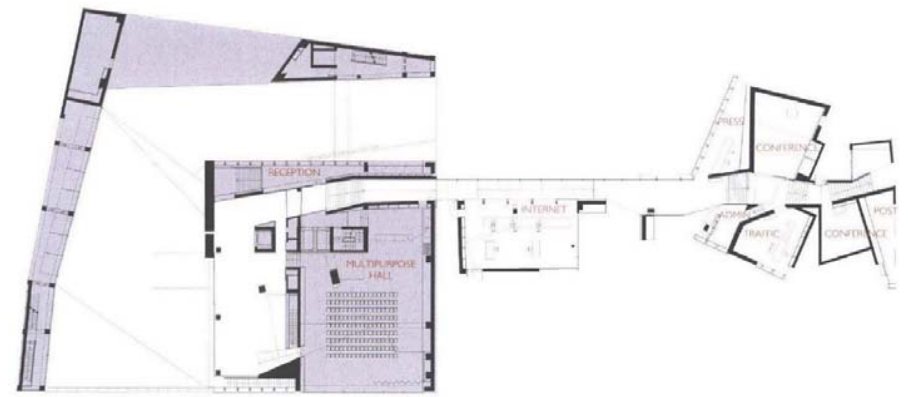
Plan of 'unravelling' trajectory (not to scale)
